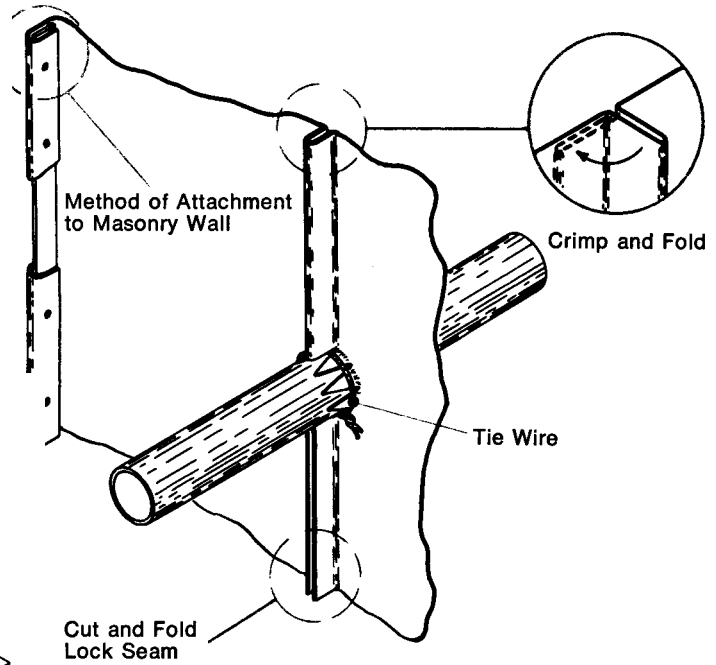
Small Pipes, Wires and Mechanical Equipment
